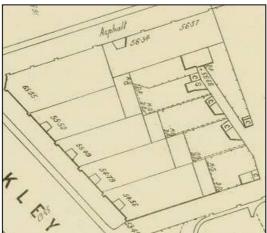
MMBW plan detail 1895 shows four shopfront recesses in Buckley St and one in Nicholson Street.
